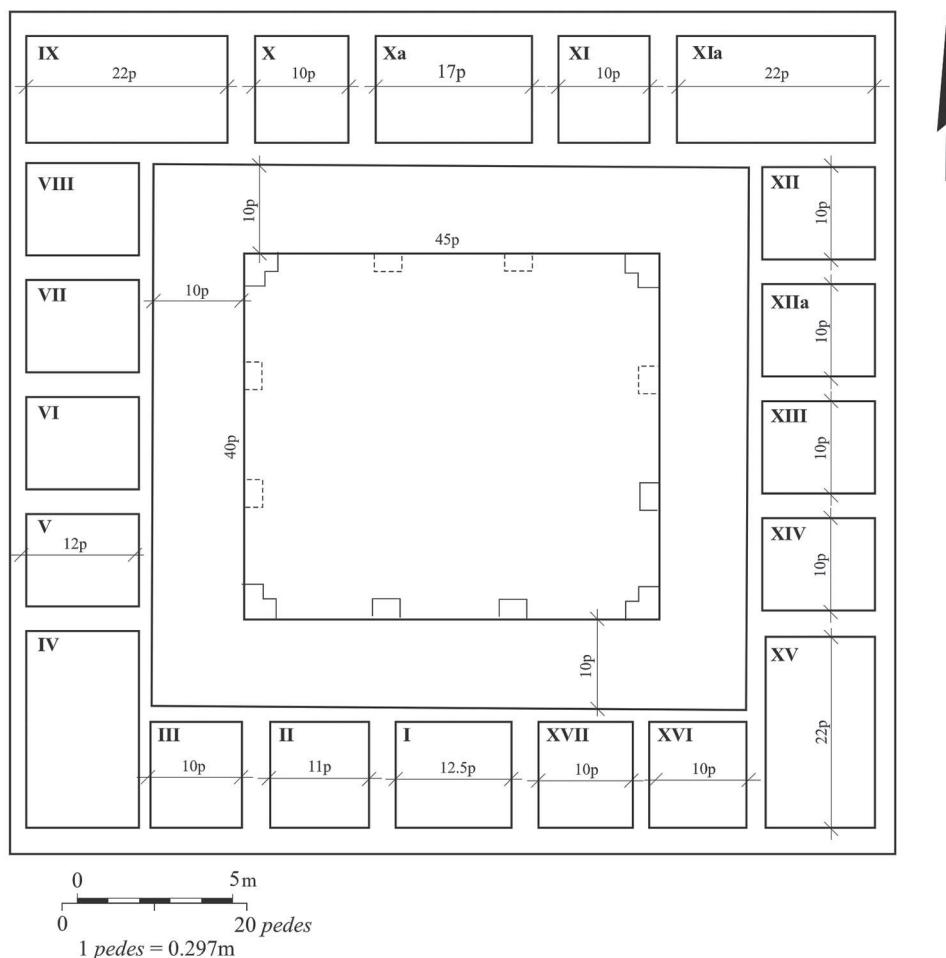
A proposed site plan of the peristyle building excavated at 'Ein ez-Zeituna (© Milson, 2006).
